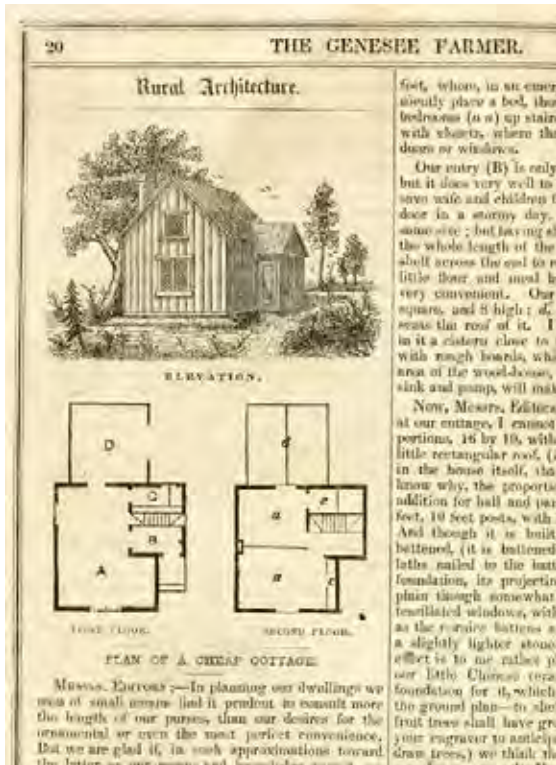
An early illustrated trade publication reference to vertical plank construction from January 1849 issue of *The Genesee Farmer*.
